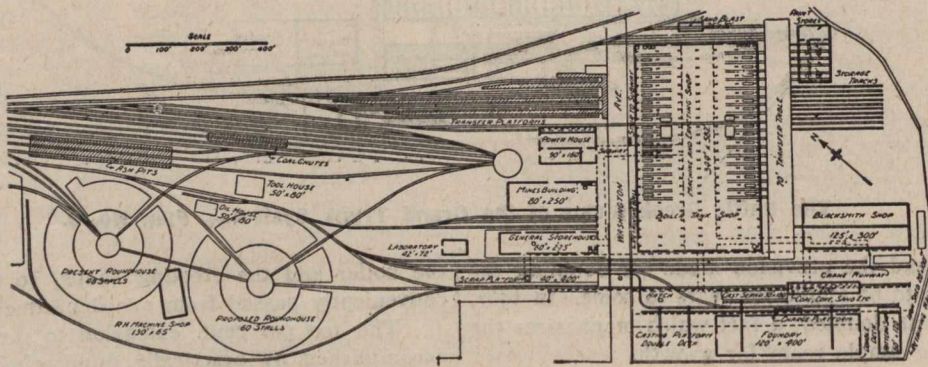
General Arrangement of New Plant now under Construction. Arrangement "B." Plan No. 6.
